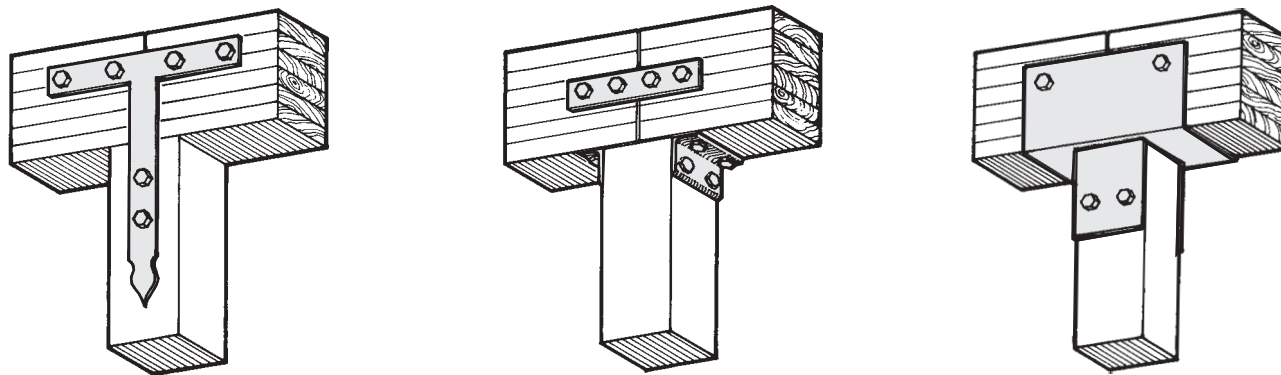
T-plate connectors (left) provide alignment and resistance to uplift. Where two heavily loaded beams meet over a column, steel angles provide extra bearing while straps tie the ends together (center). Where a heavily loaded beam sits on a post, a welded steel U-plate spreads the load and prevents the beam's wood fibers from crushing (right).
